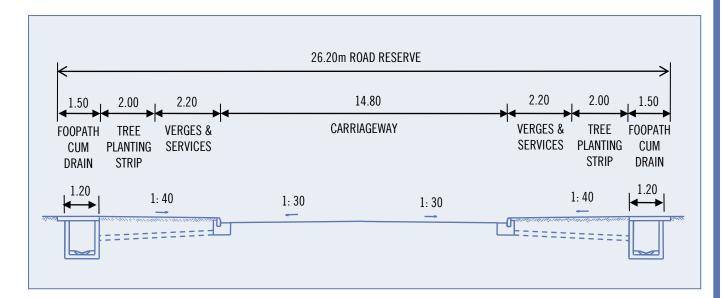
Undivided Two-Way Roads (4 Lanes)
